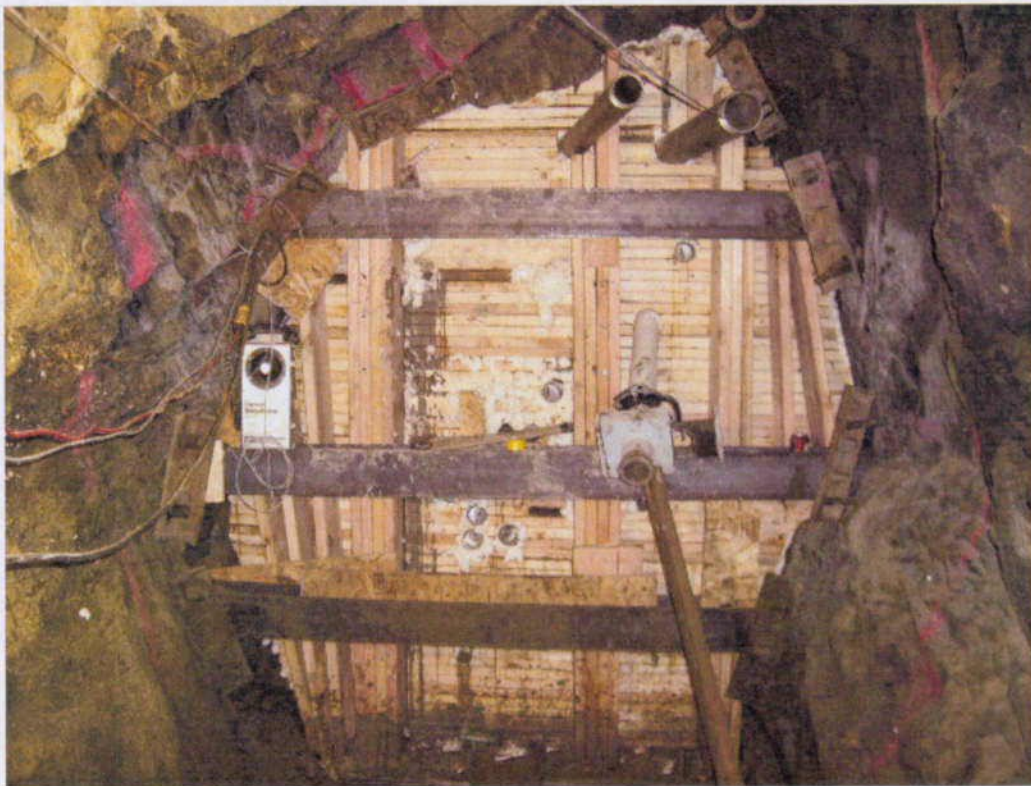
Steve adit bulkhead forms, showing contact grout pipes, concrete injection line, and additional pipes for remote shaft water monitoring (above)
